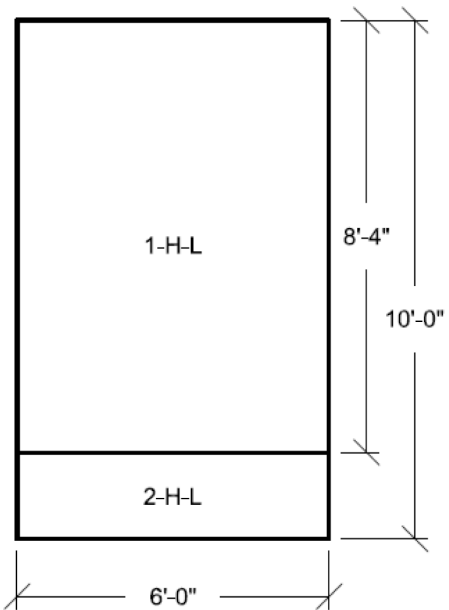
H.6-159 DGFOV Roof 6 Looking Down
